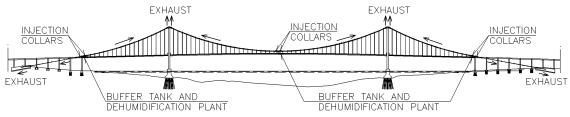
Dehumidification system layout, Little Belt Bridge, Denmark
